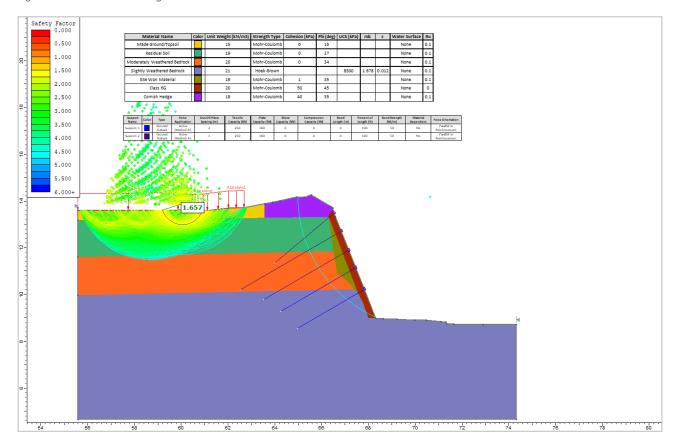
Section 4 – Facing Installation - BS8006 Set2
